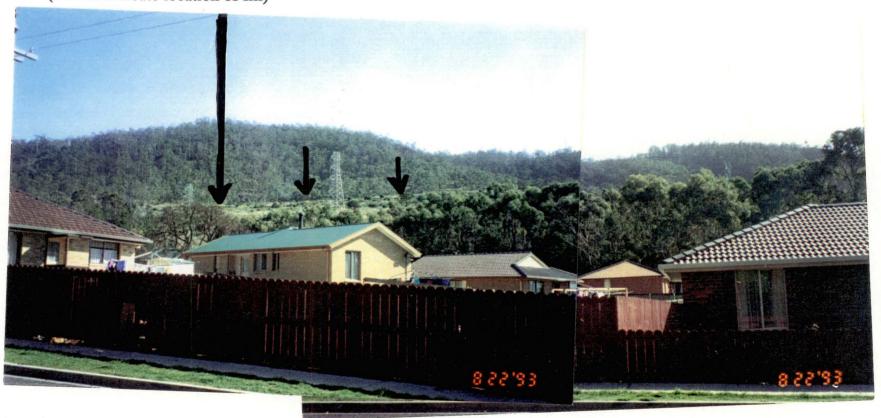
Top of pipe running underneath the Chapel Street Tip Site
